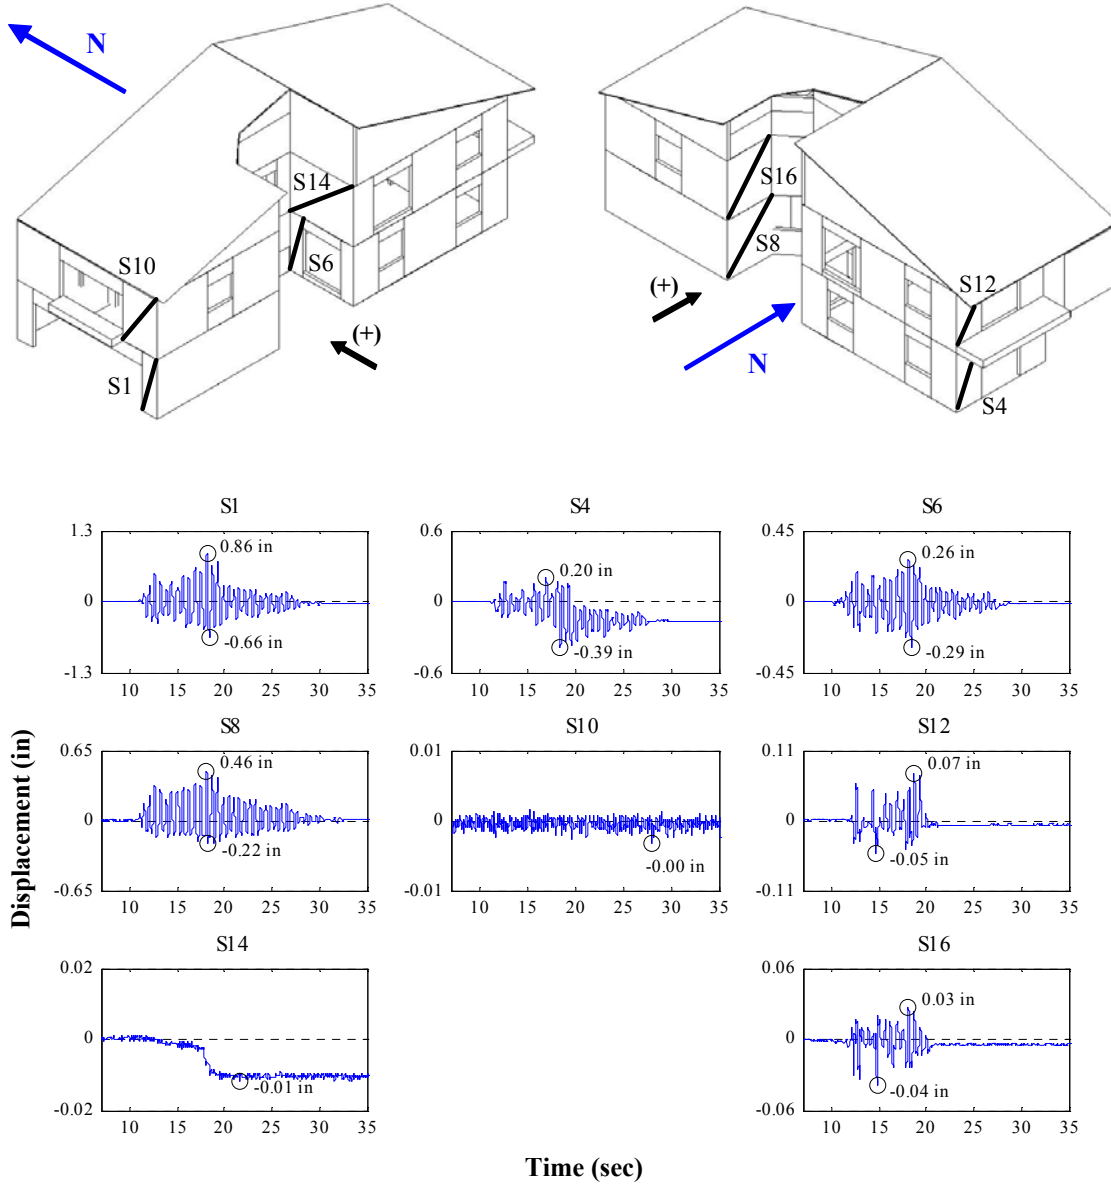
Wall deformations of north-south external walls for Test NWP5S07
